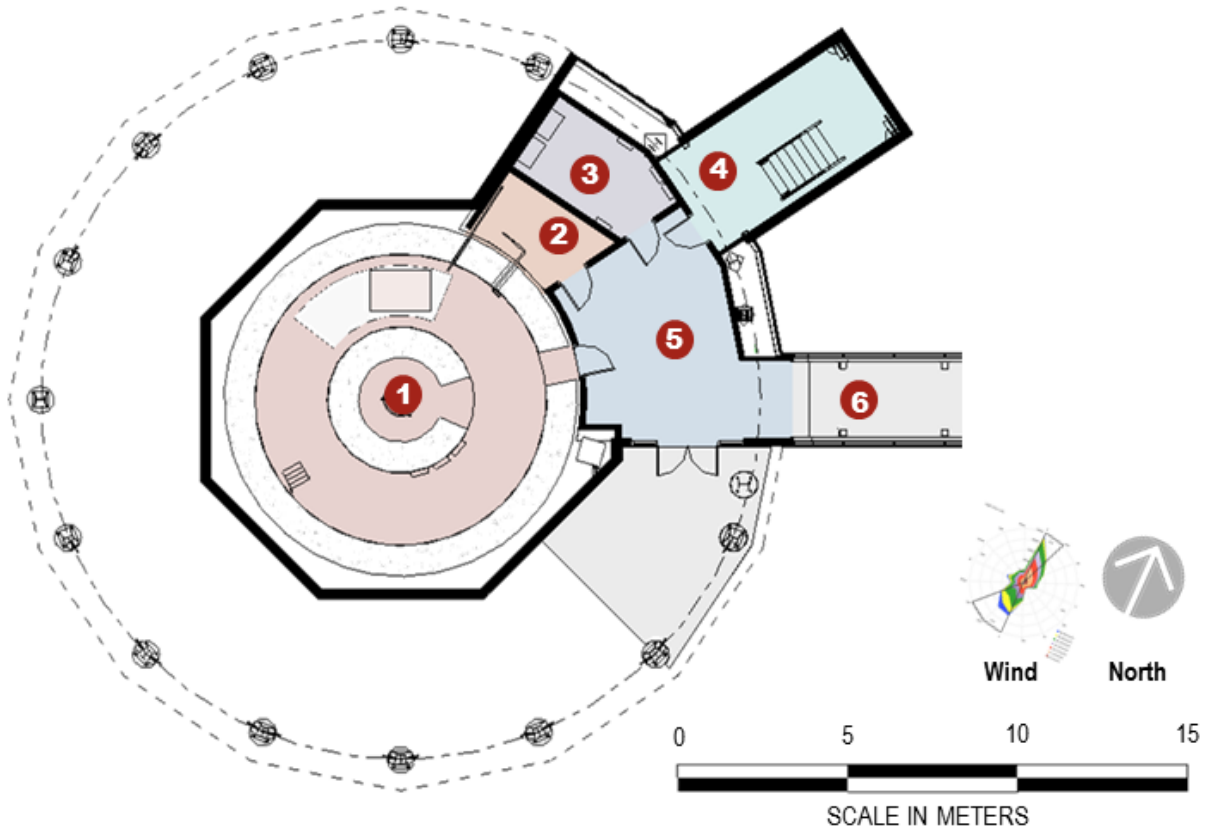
Enclosure Floor Plan – Ground Level
